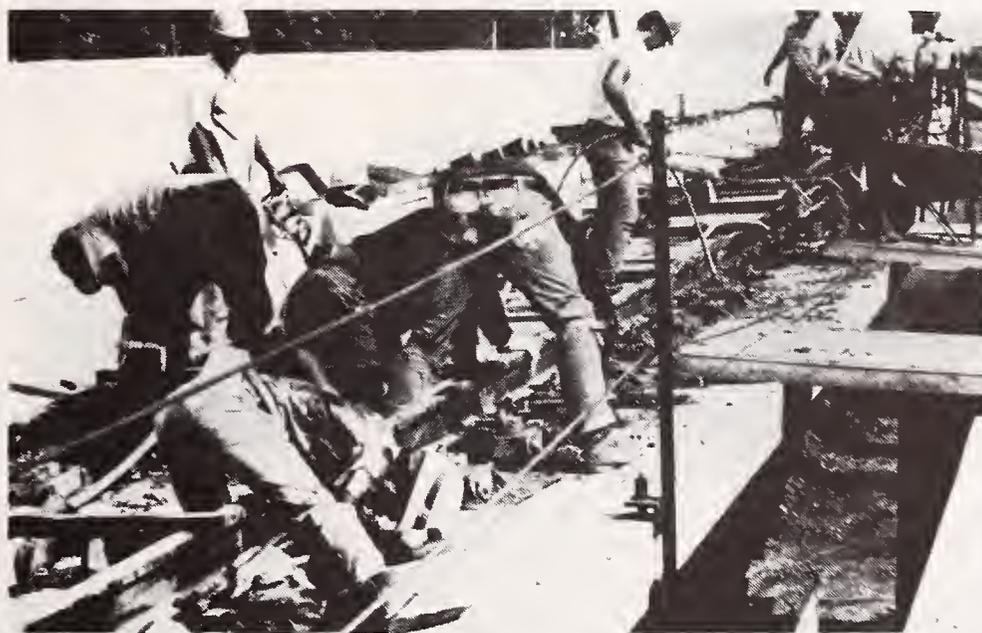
AERIAL TRACK INSTALLATION WITH HIXSON FASTENER
